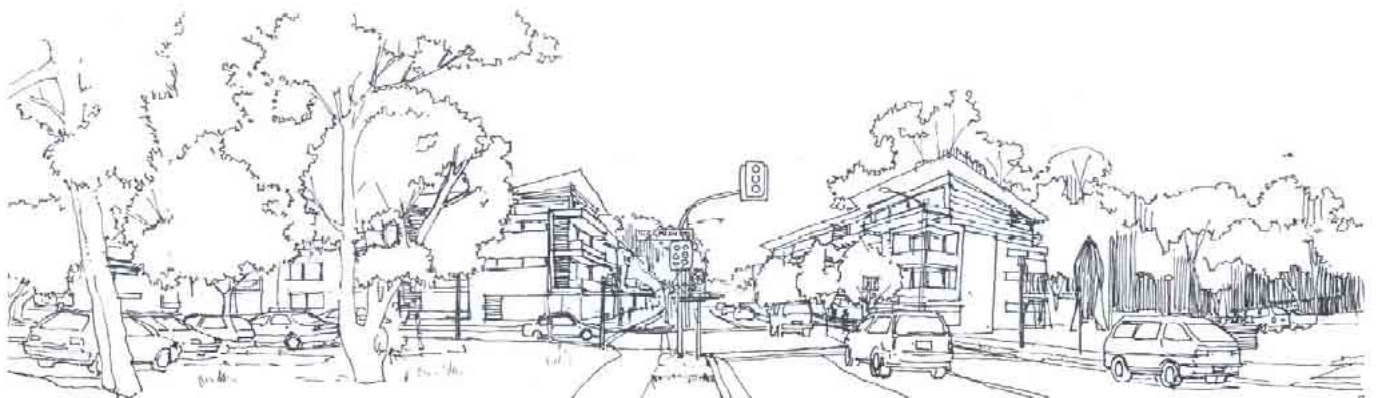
Proposed after treatment of the Entrance Road at Tuggerah Parade
